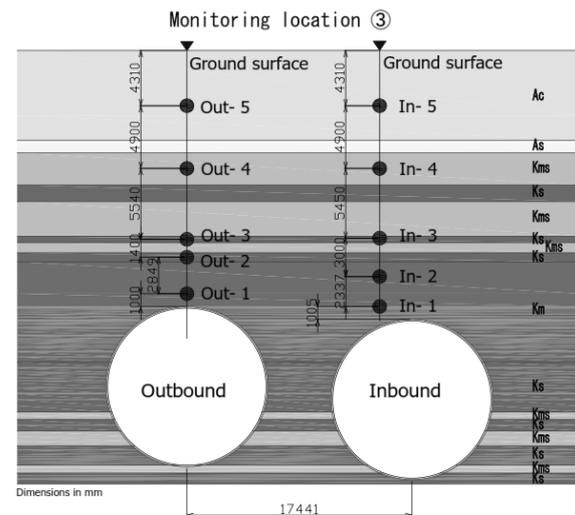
Cross section of newly constructed parallel tunnels in the ML3; Outbound and Inbound lines as well as measurement devices location are shown.
